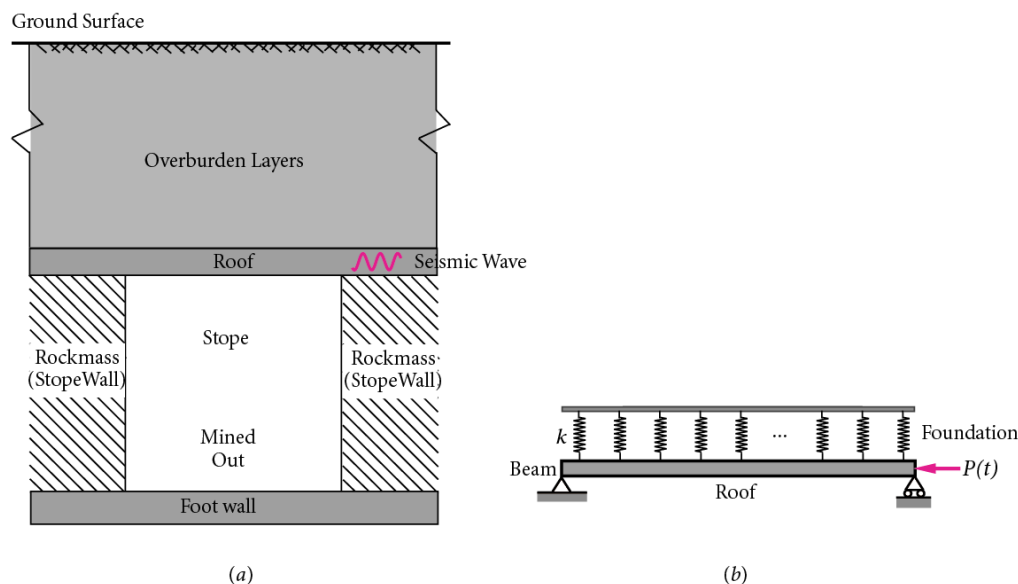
Stope roof in underground mining and its model as a beam on elastic foundations
